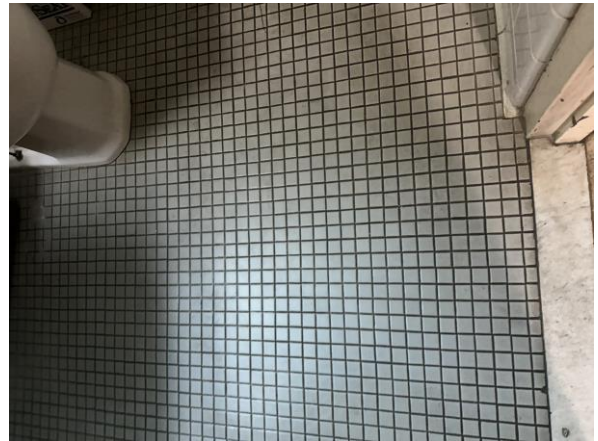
HA-4: 1"x1" Green ceramic floor tile with grout
